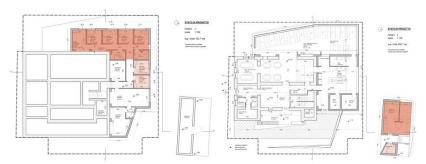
Identification of spaces: worker rooms project (left) and winter shelter/educational room project (right)
